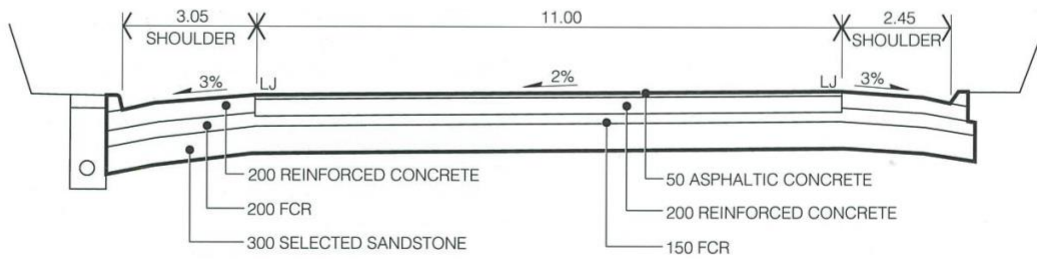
Warringah Freeway, 3-lane carriageway showing concrete shoulders, lane longitudinal joints not shown (converted from original imperial units)
